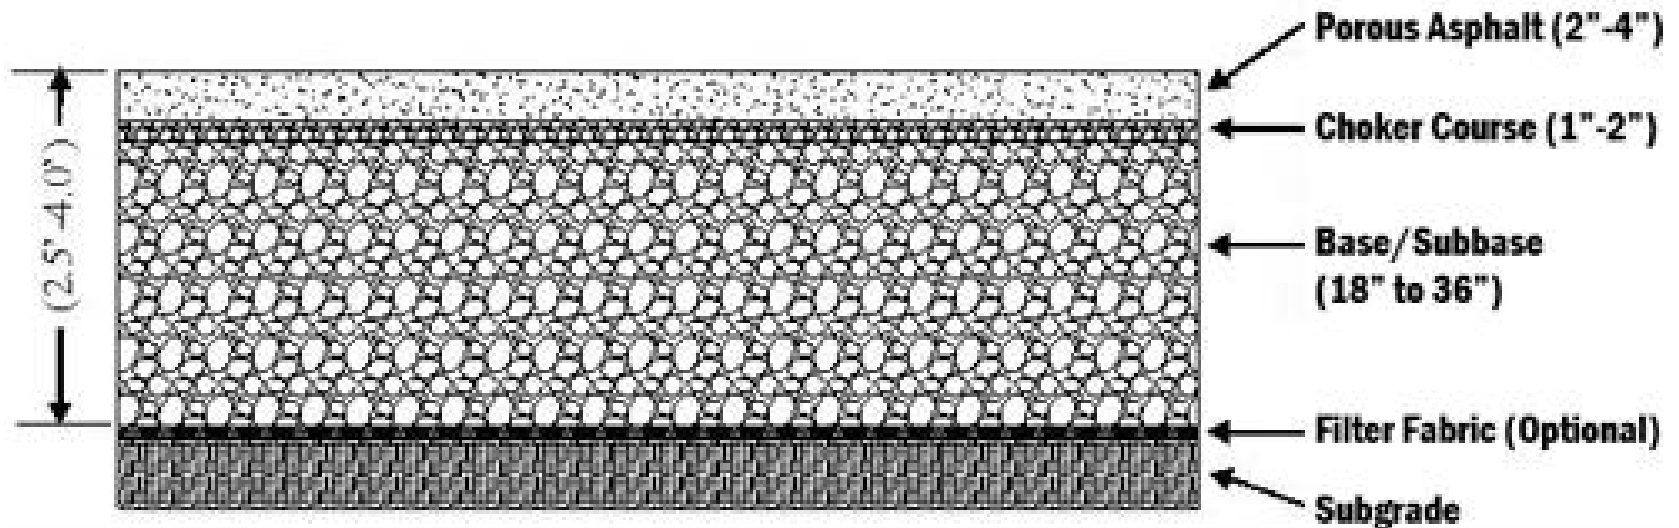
Typical Porous Asphalt Pavement Section (*diagram adapted from US EPA*)
